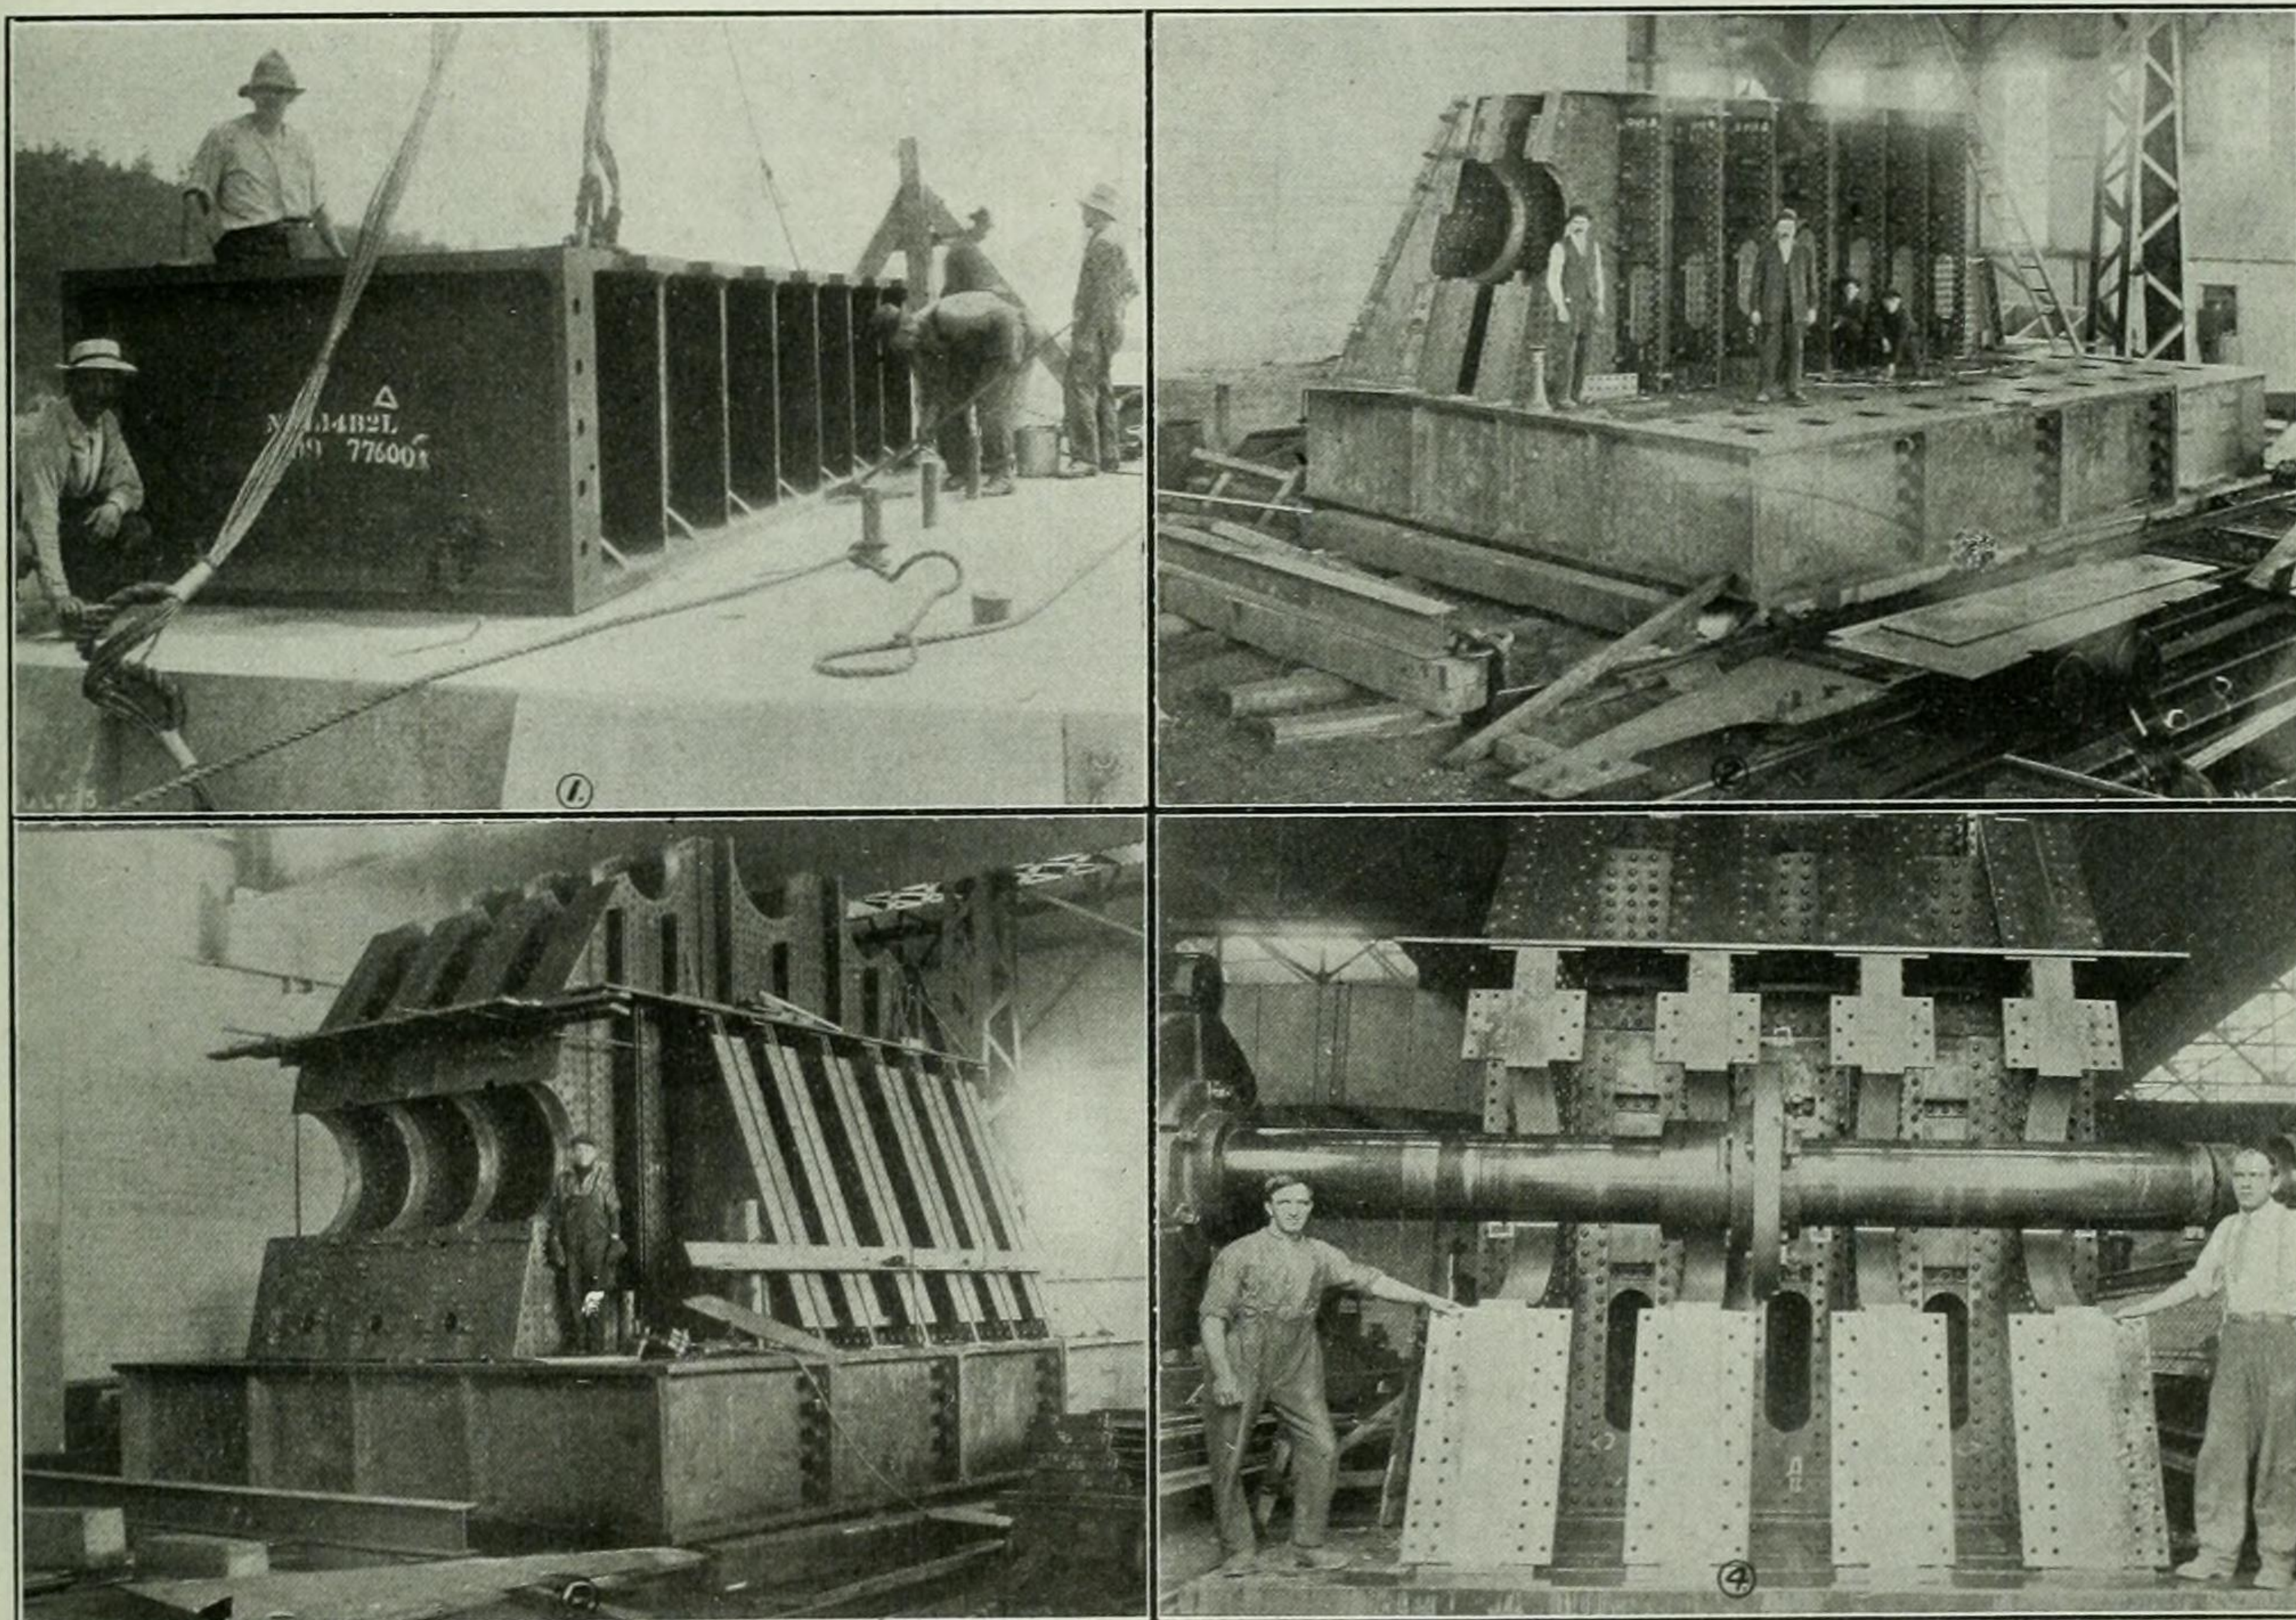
One of the 4 Castings Being Placed on the Pier. Fig. 2.—Casting Assembled (shop) and Second Story Under Construction. Fig. 3.—Second and Third Stories Nearing Completion. Fig. 4.—Method of Boring 45-inch Pin-hole.
